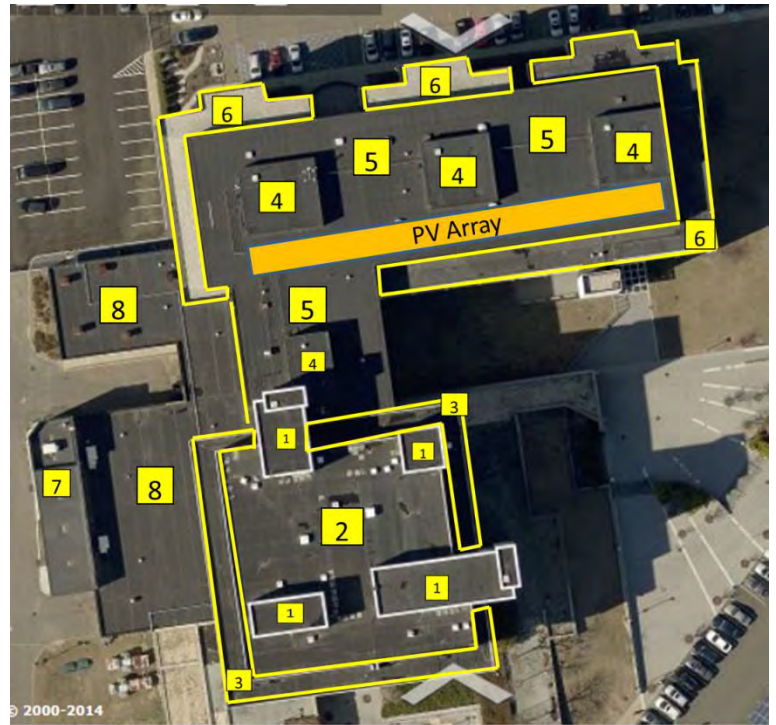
Roof of Criminal Courts Building with possible PV array arrangement.
